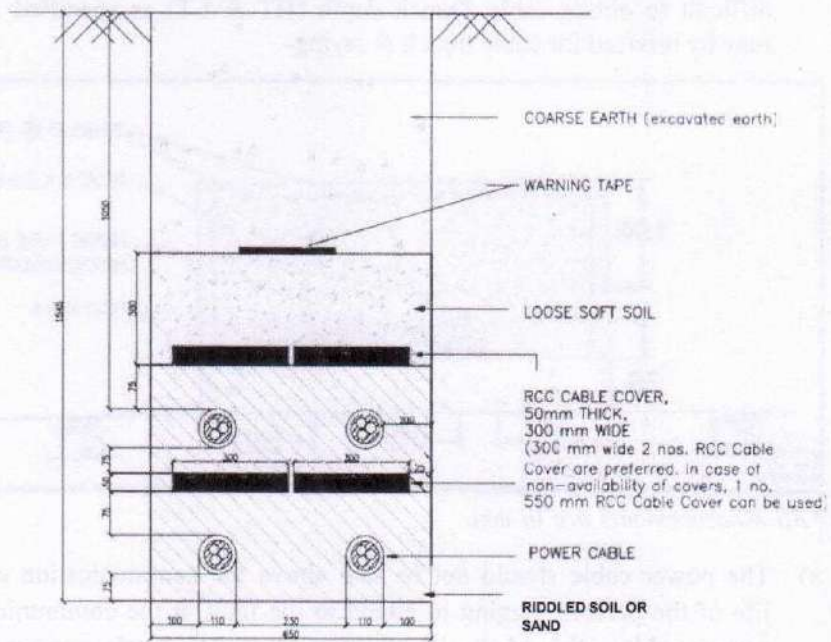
33kV Buried Cable for Single Circuit
